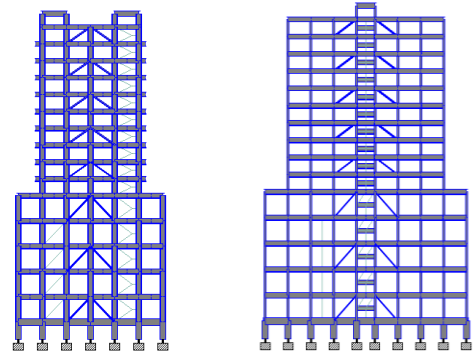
Elevation View of Proposed Structure M-I (X & Z-Direction)
